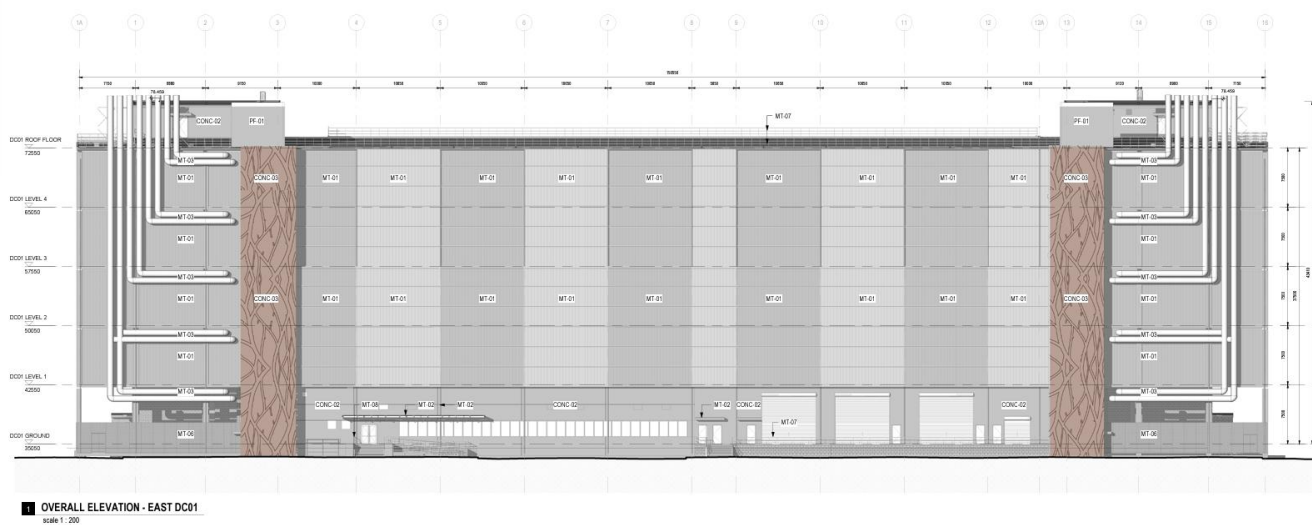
Overall Elevation - East DC01 of proposed development (Source: GREENBOX ARCHITECTURE)
